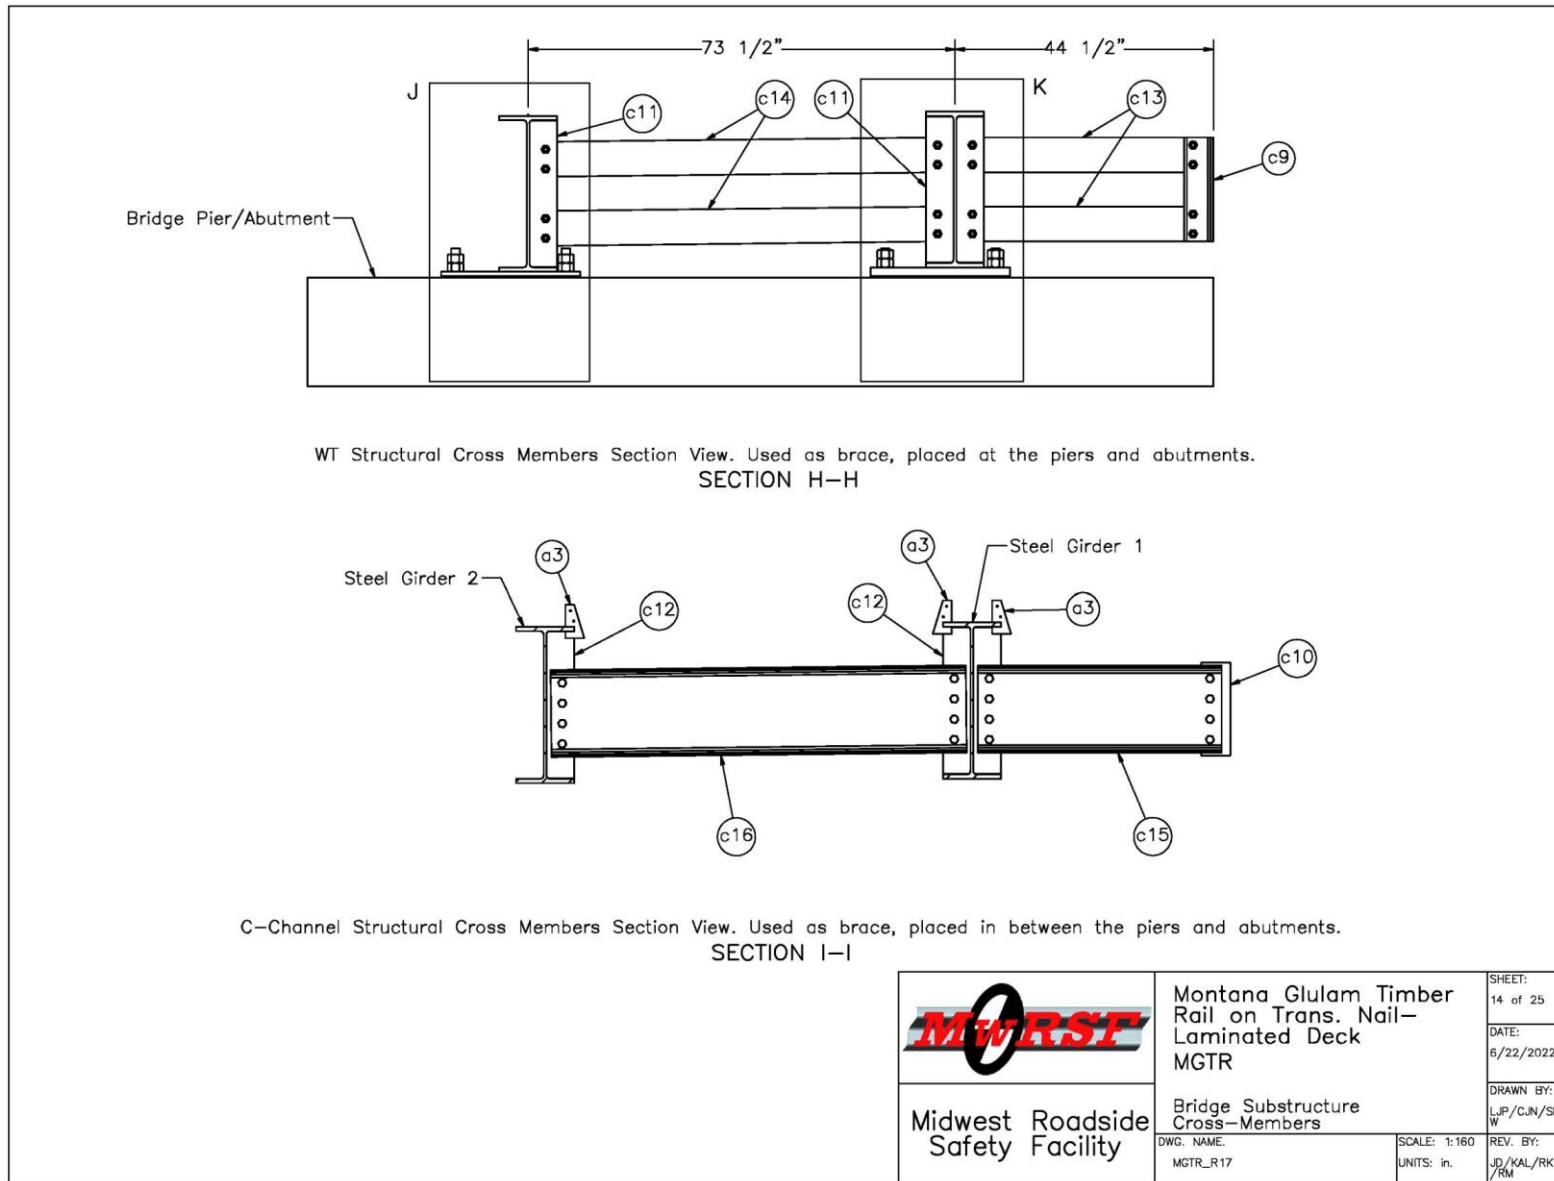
Bridge Superstructure and Substructure, Test Nos. MGTR-1S and MGTR-1D
